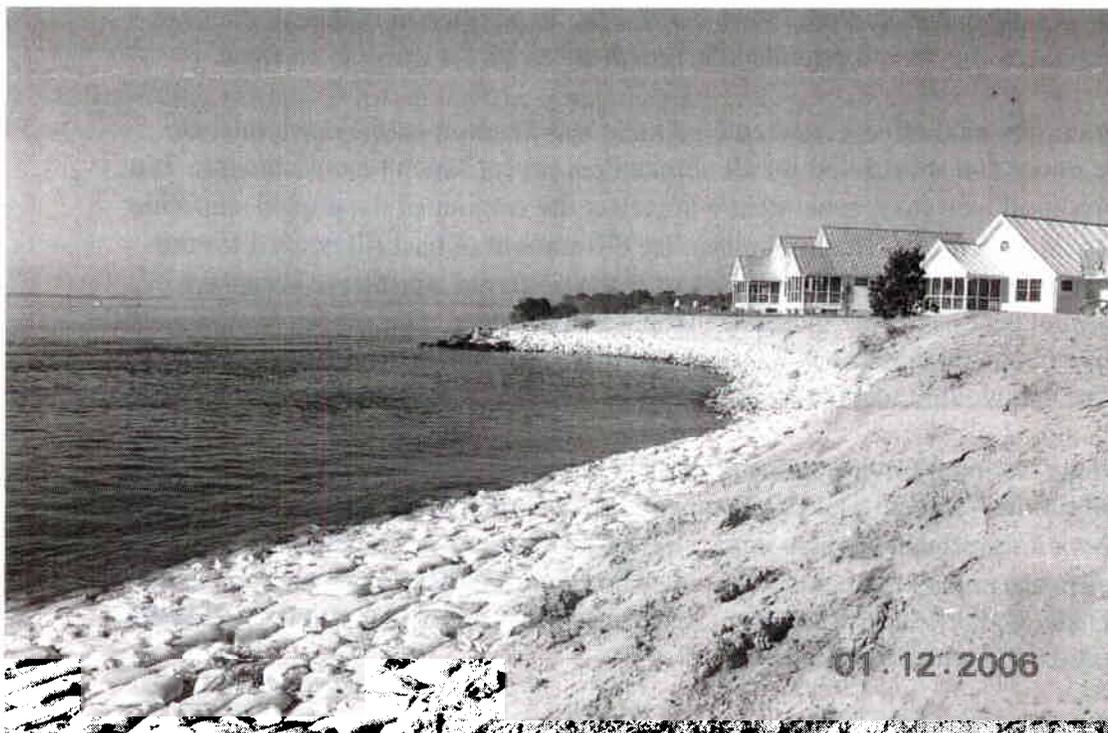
Existing conditions of the project site (looking westward) showing the sandbags that were placed as a temporary erosion control measure (photo January 2006).
